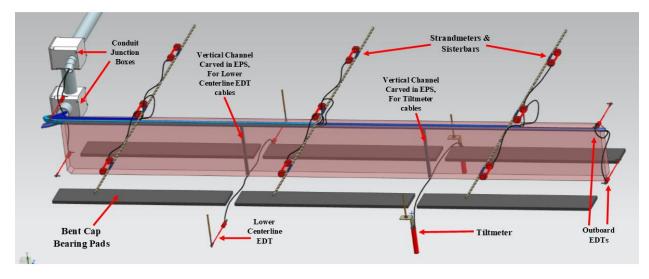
, Exposed View of Cable Routing (EPS is Translucent)
